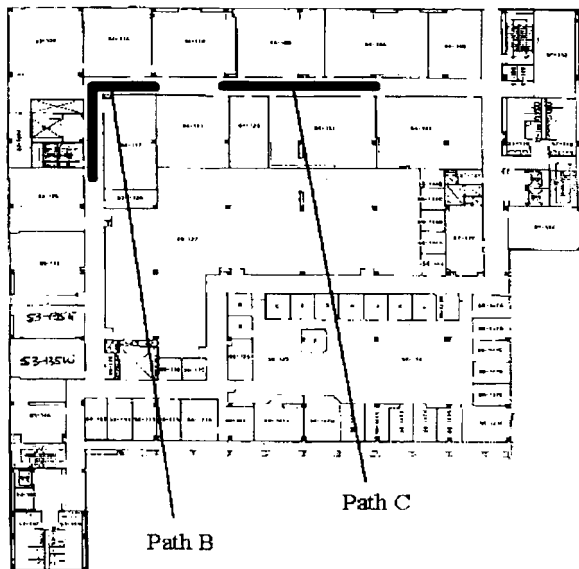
Floor layout of the fifth floor of the Engineering IV building on the UCLA campus, with the test paths B and C indicated. The approximate floor dimensions are 67 m \times 60 m.
